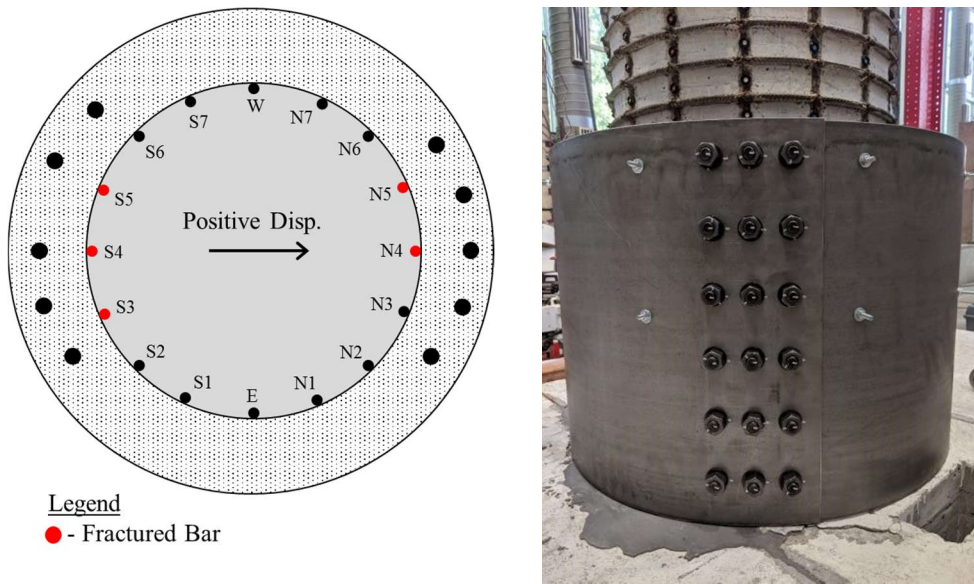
Repair cross section and bolt configuration for Repair #2.
